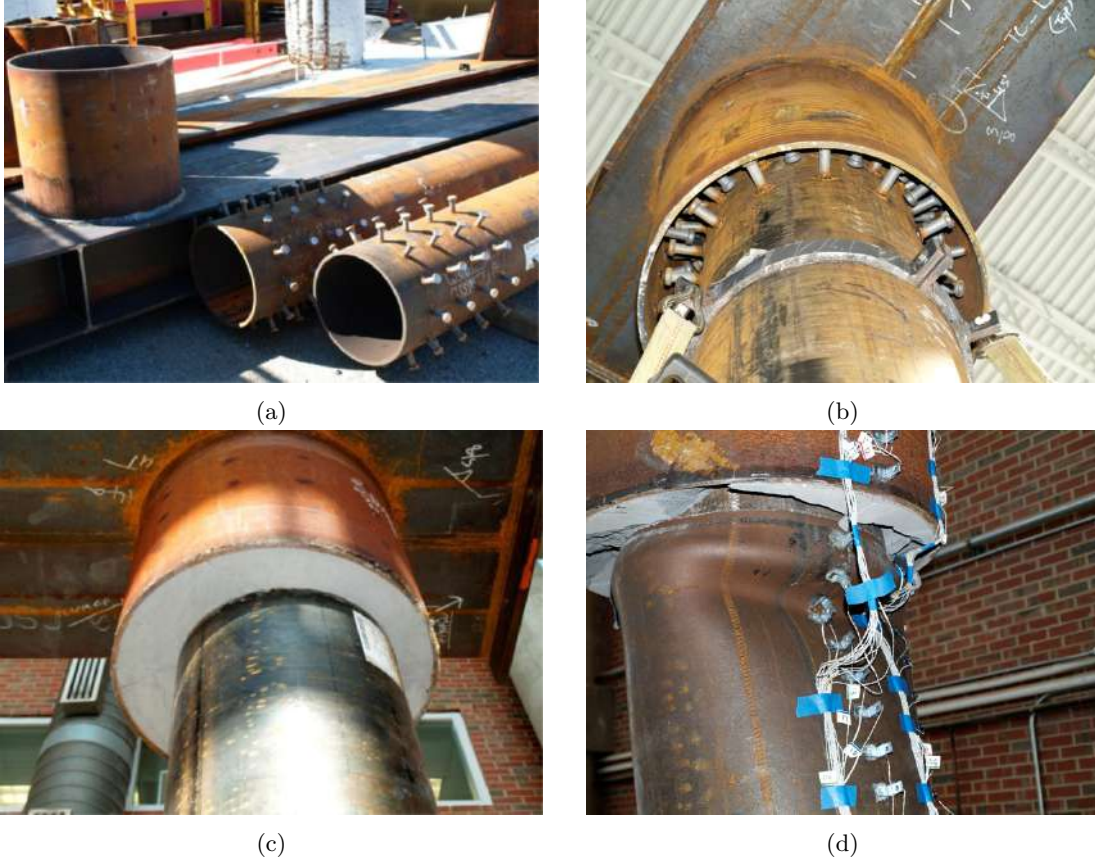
Stages of the GSS connection: (a) Constituent components, (b) Connection before grouting, (c) Connection after grouting, (d) Failure by plastic hinge relocation.
